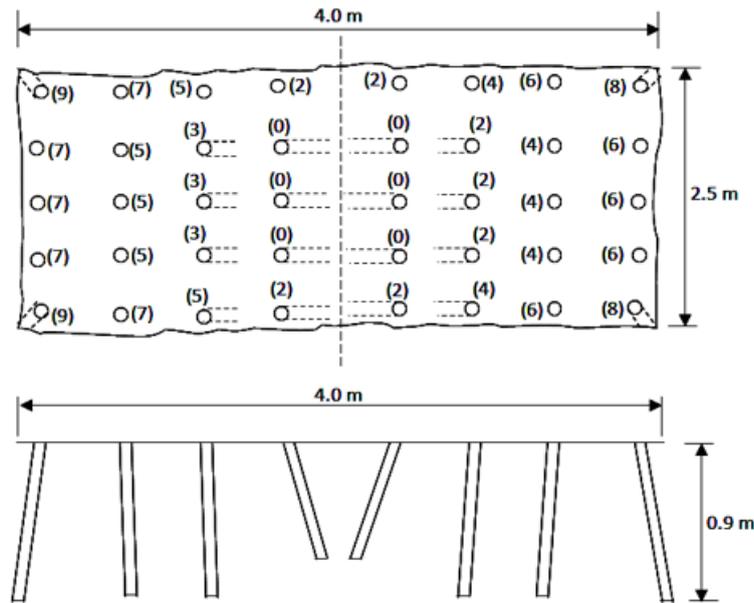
(c): Winze plan view and sectionalized view
